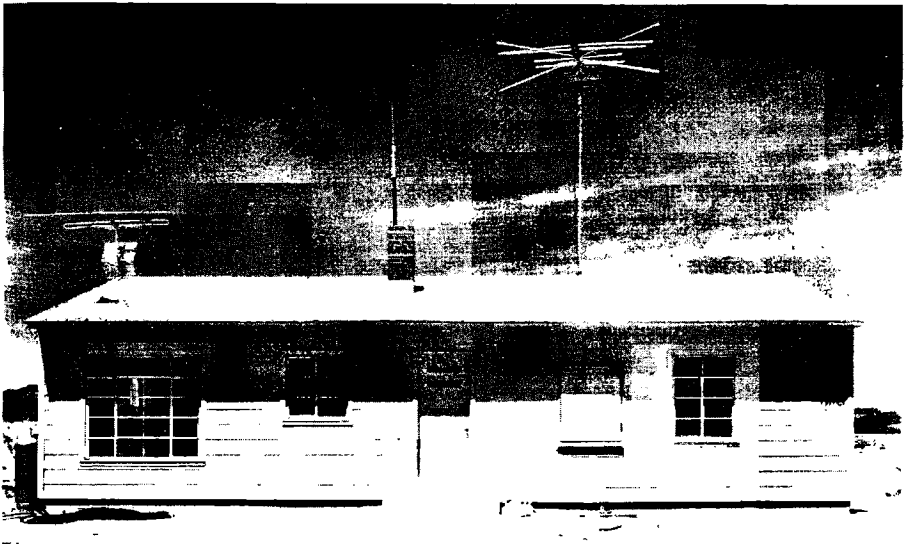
Rambler-type house before a nuclear explosion, Nevada Test Site. (Note blast door over bathroom window at right.)
